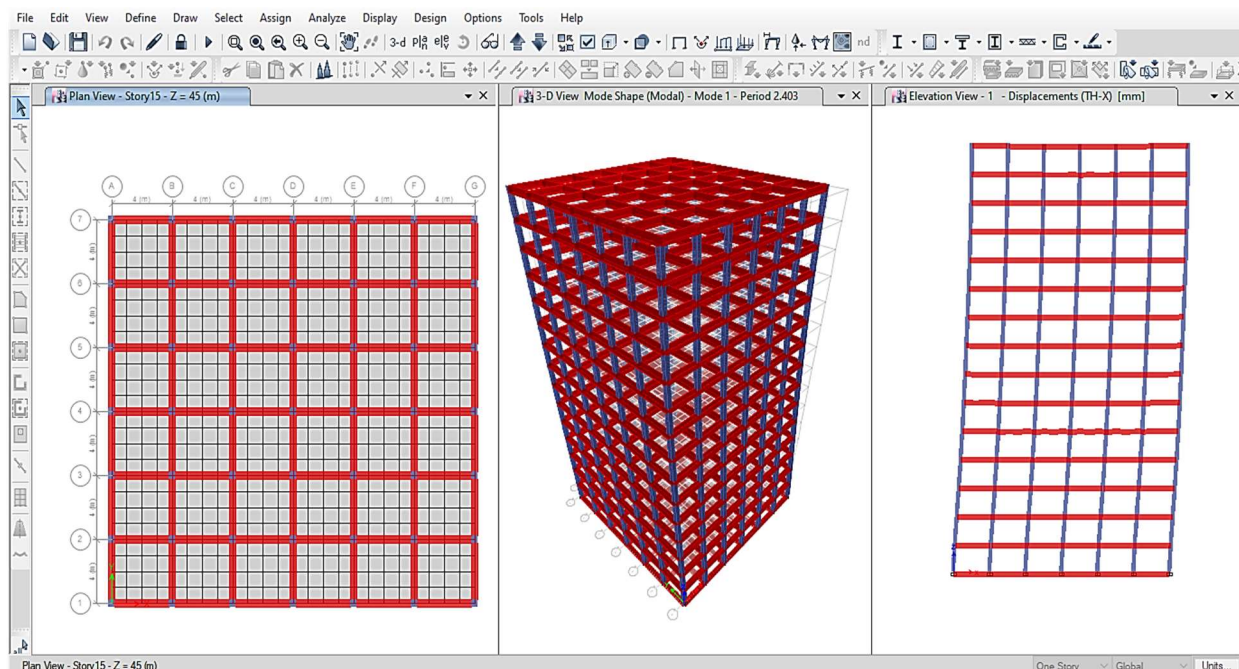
Plan, 3D & Elevation view of fixed base square plan building
